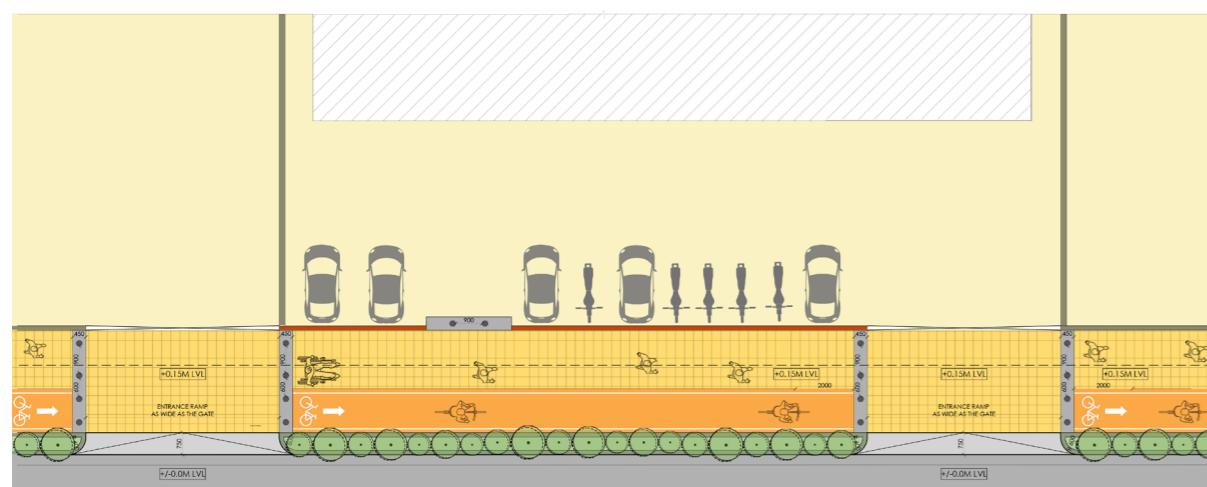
Restricting onstreet parking using Ledge wall to define property edge
